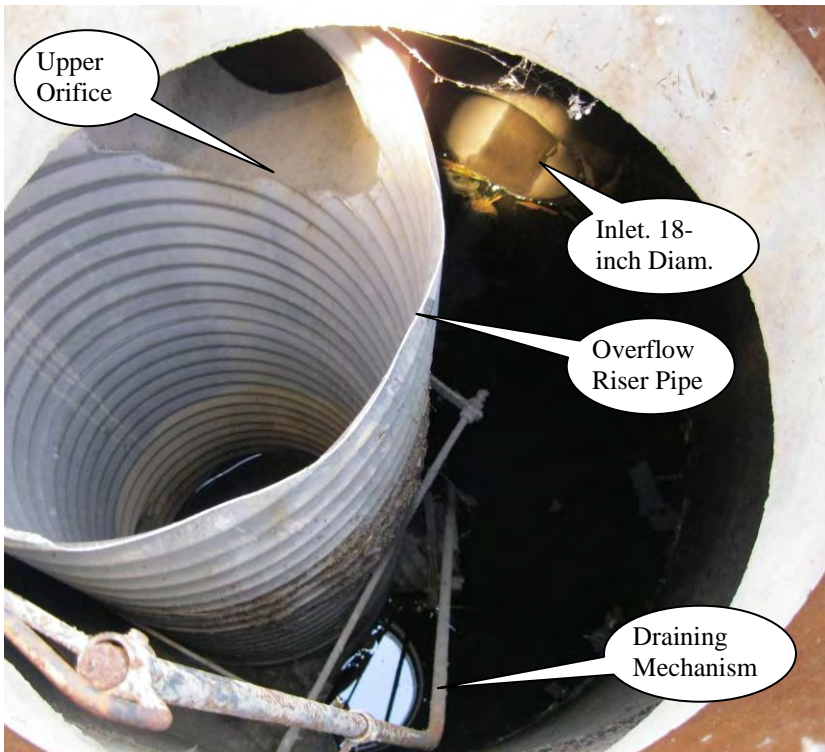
Interior view from Access N to flow control manhole. Shows draining mechanism and top of riser pipe. Inlet illuminated by flashlight (Point E on Operational Plan in Appendix A)
